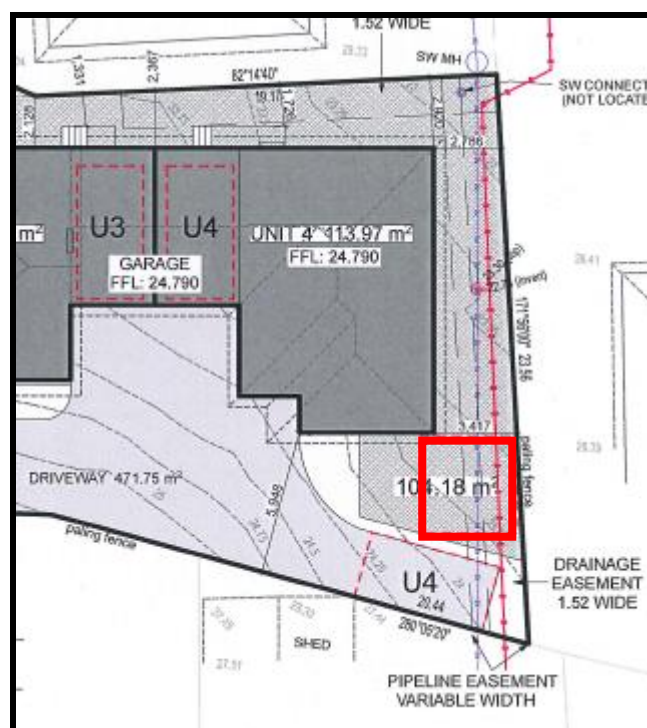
An excerpt of the site plan showing the location of the private outdoor space of dwelling 4
